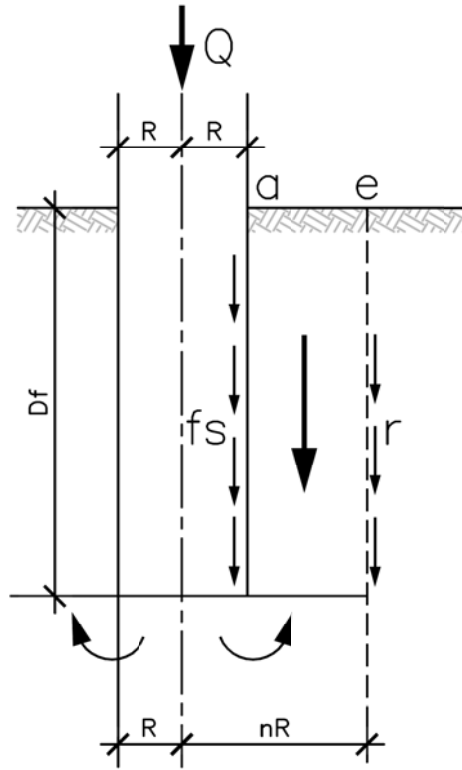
Failure mechanism for cylindrical piers (after from Terzaghi, 1943)
